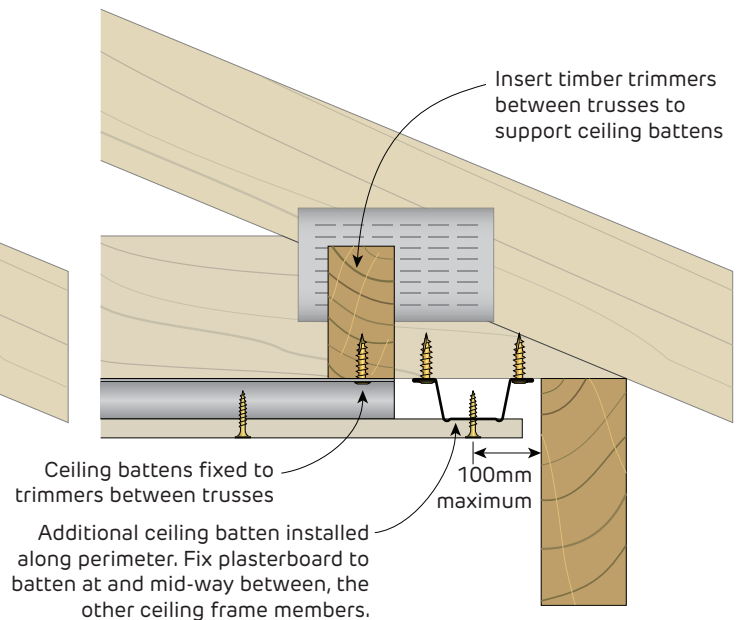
Plasterboard Ceiling Fixed to Battens
